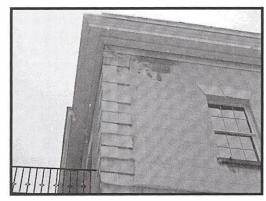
Image illustrates water infiltration experienced at the southeast corner of structure's second story. Saturation of stucco surface is consistent with damage discovered with the building's second-story southeast collections storage room.
